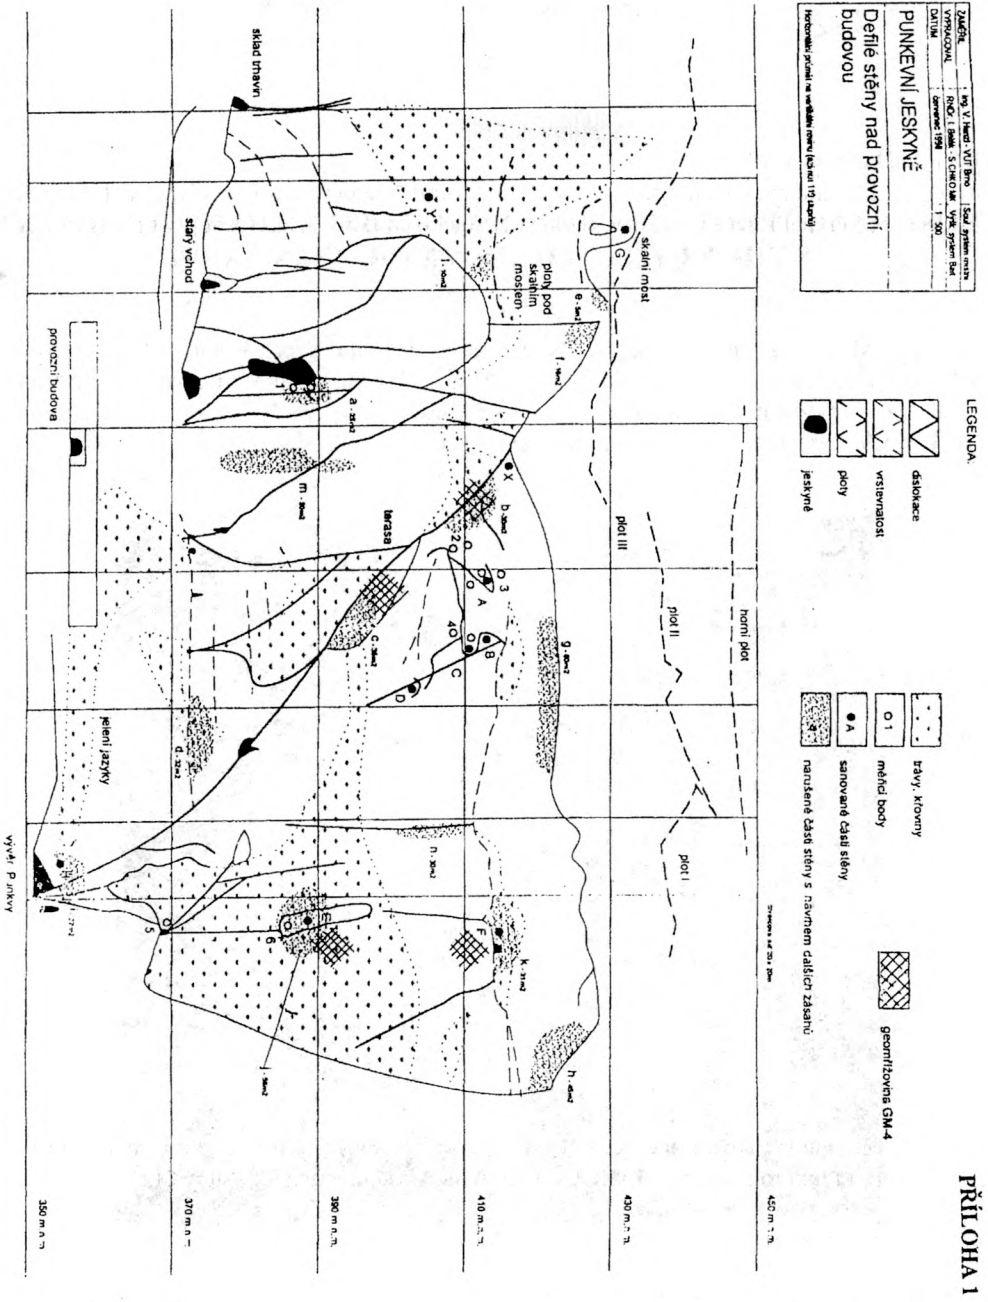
Geotechnical sketch based on the photogrammetric measurement
